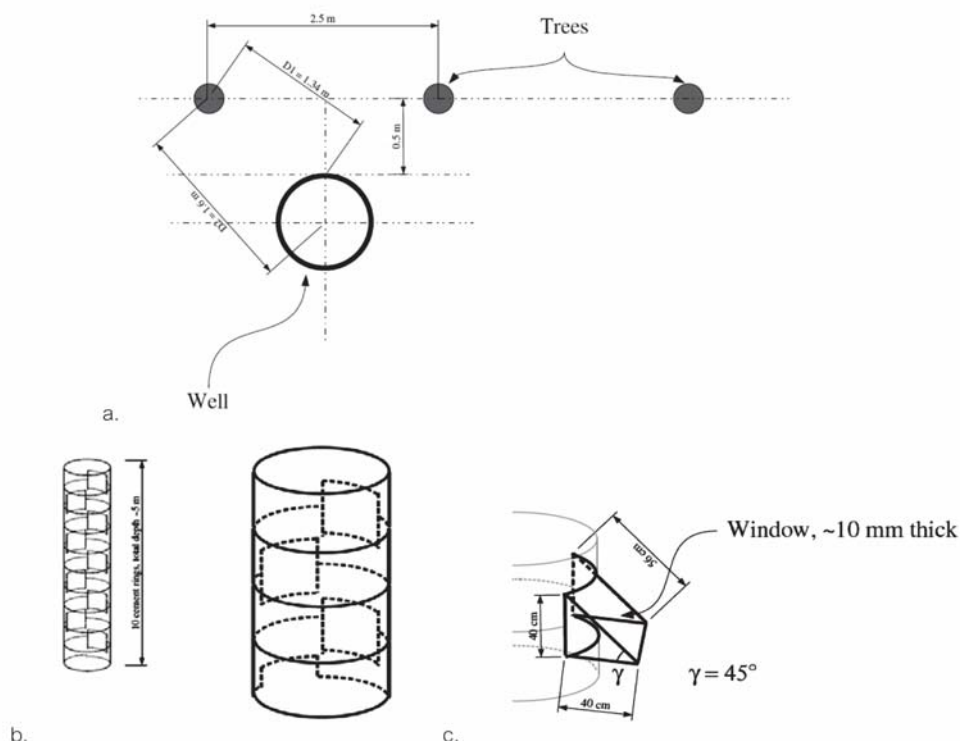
Schematic view of the root access-well. a. Location of the well in relation to the tree row (horizontal projection). b. General arrangement of the concrete rings. Note the openings cut to allow root window installation. c. Side view of the soil volume excavated for root window installation.
